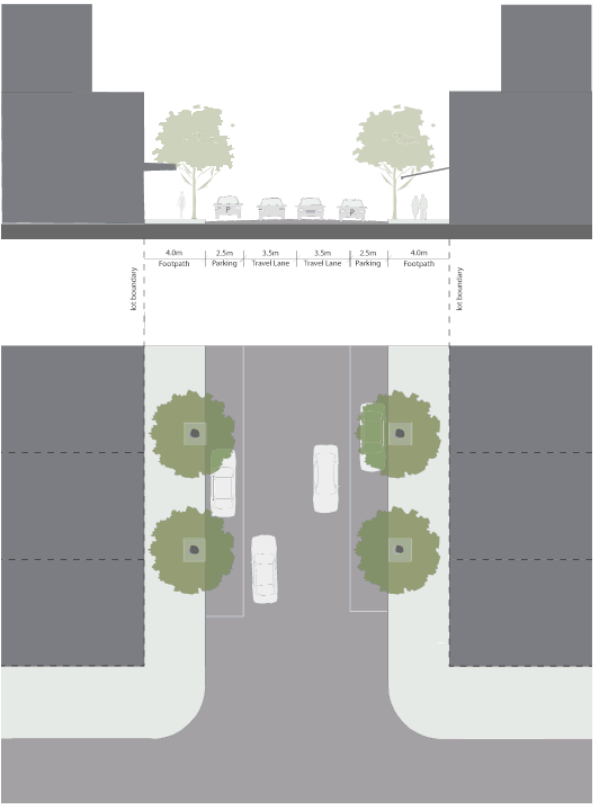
PROPOSED INDICATIVE FUTURE STREETScape -FREDERICK STREET
